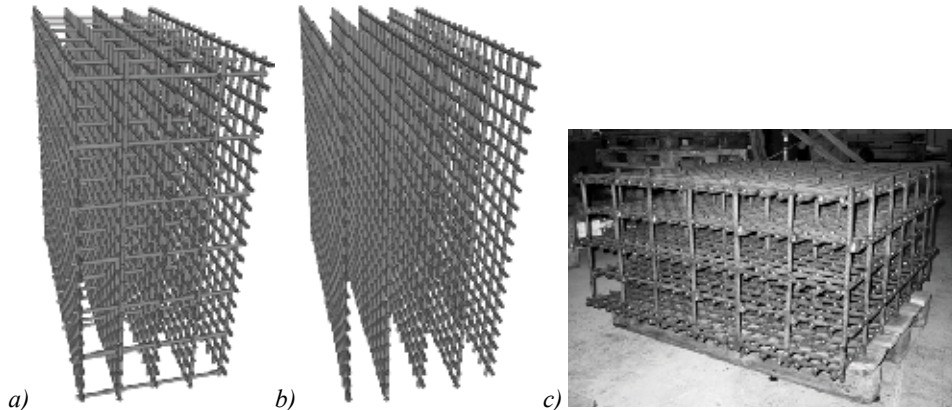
Simplified reinforcement layouts, with (a) and without (b) connecting rebars between the reinforcement layers. The photo shows the reinforcement used for the experiments (c) [10].
